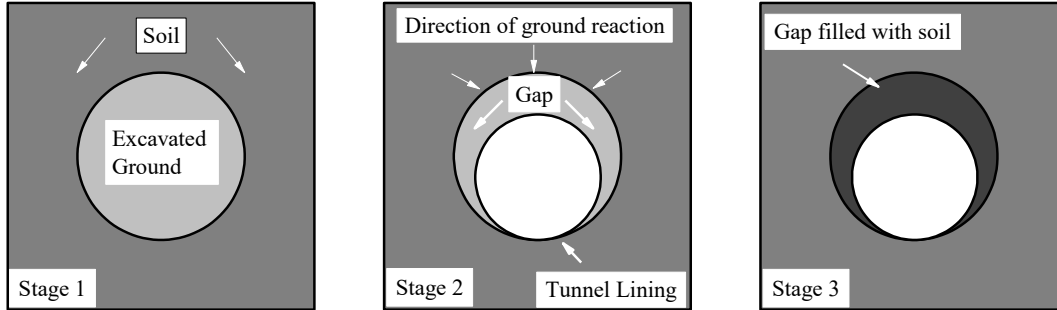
Steps of tunnel construction using Tunnel Boring Machine
